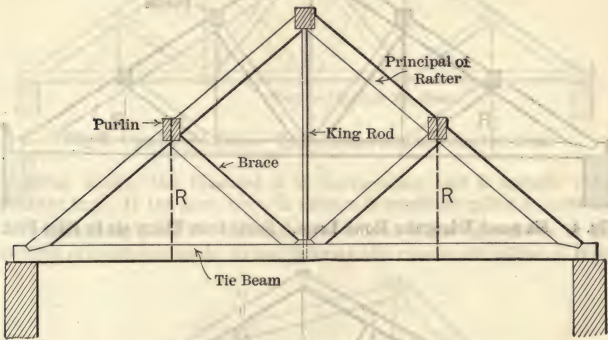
King-rod Truss. Spans up to Thirty-six Feet
